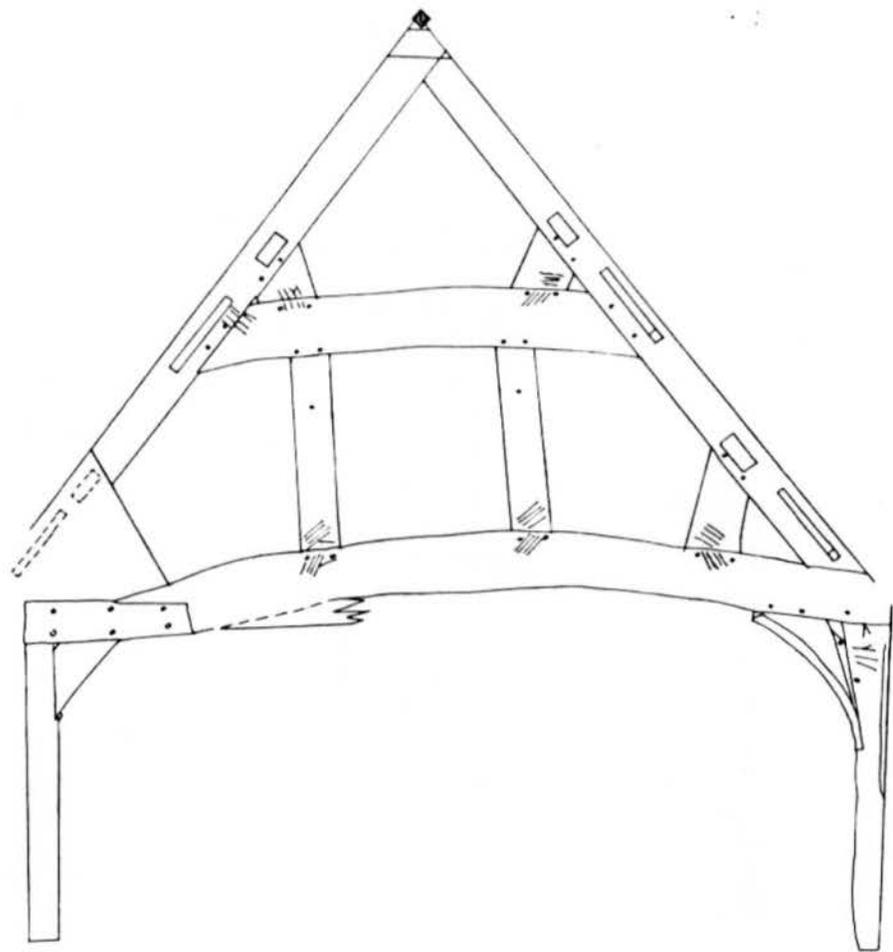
Roof. Truss No.2 [Archive] - J. Sterenberg et al.
